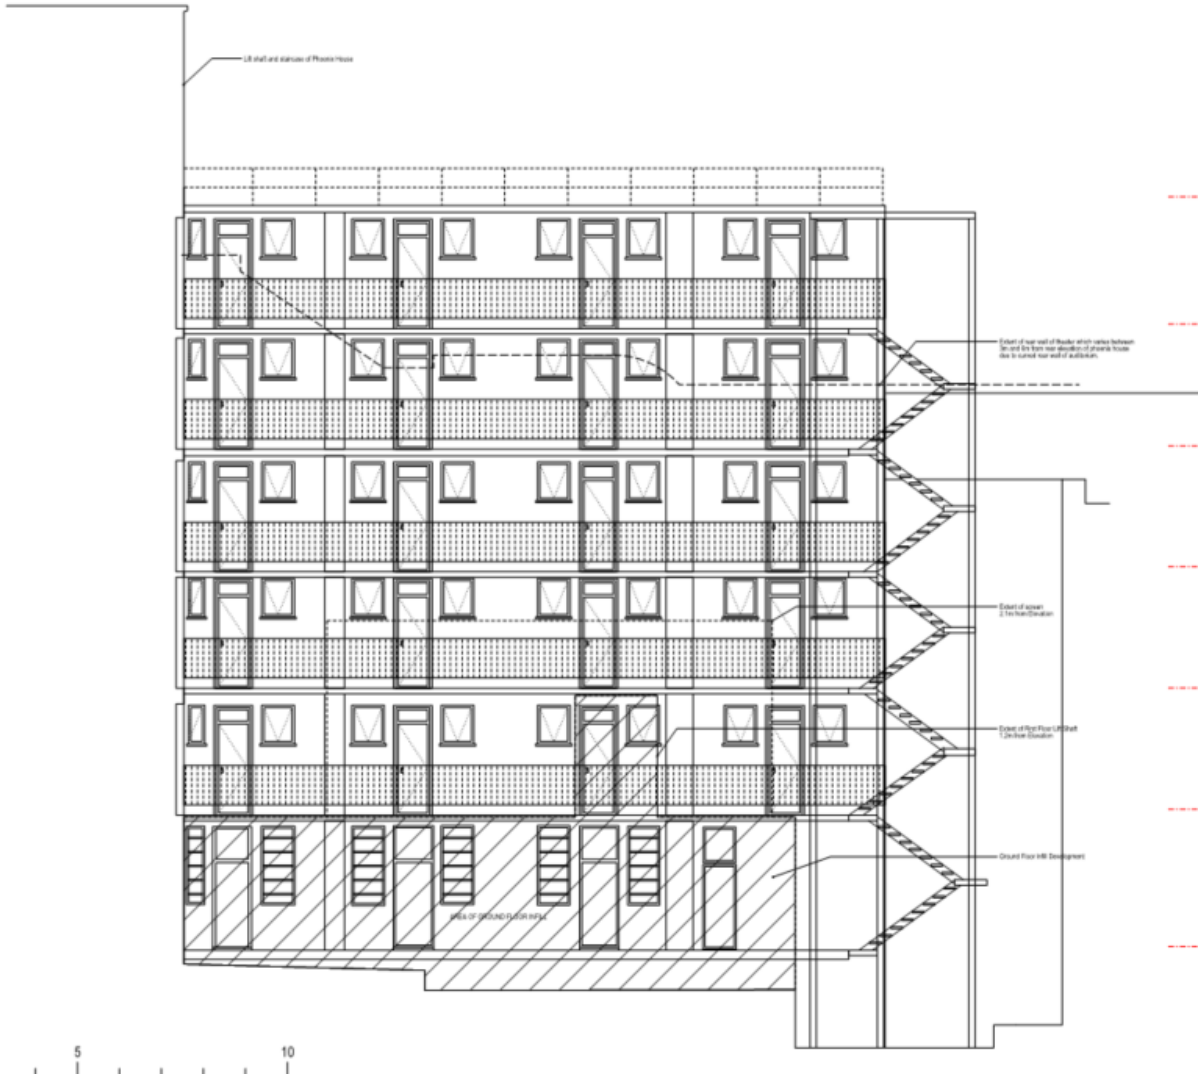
(above): Existing and proposed rear elevation of Phoenix House
